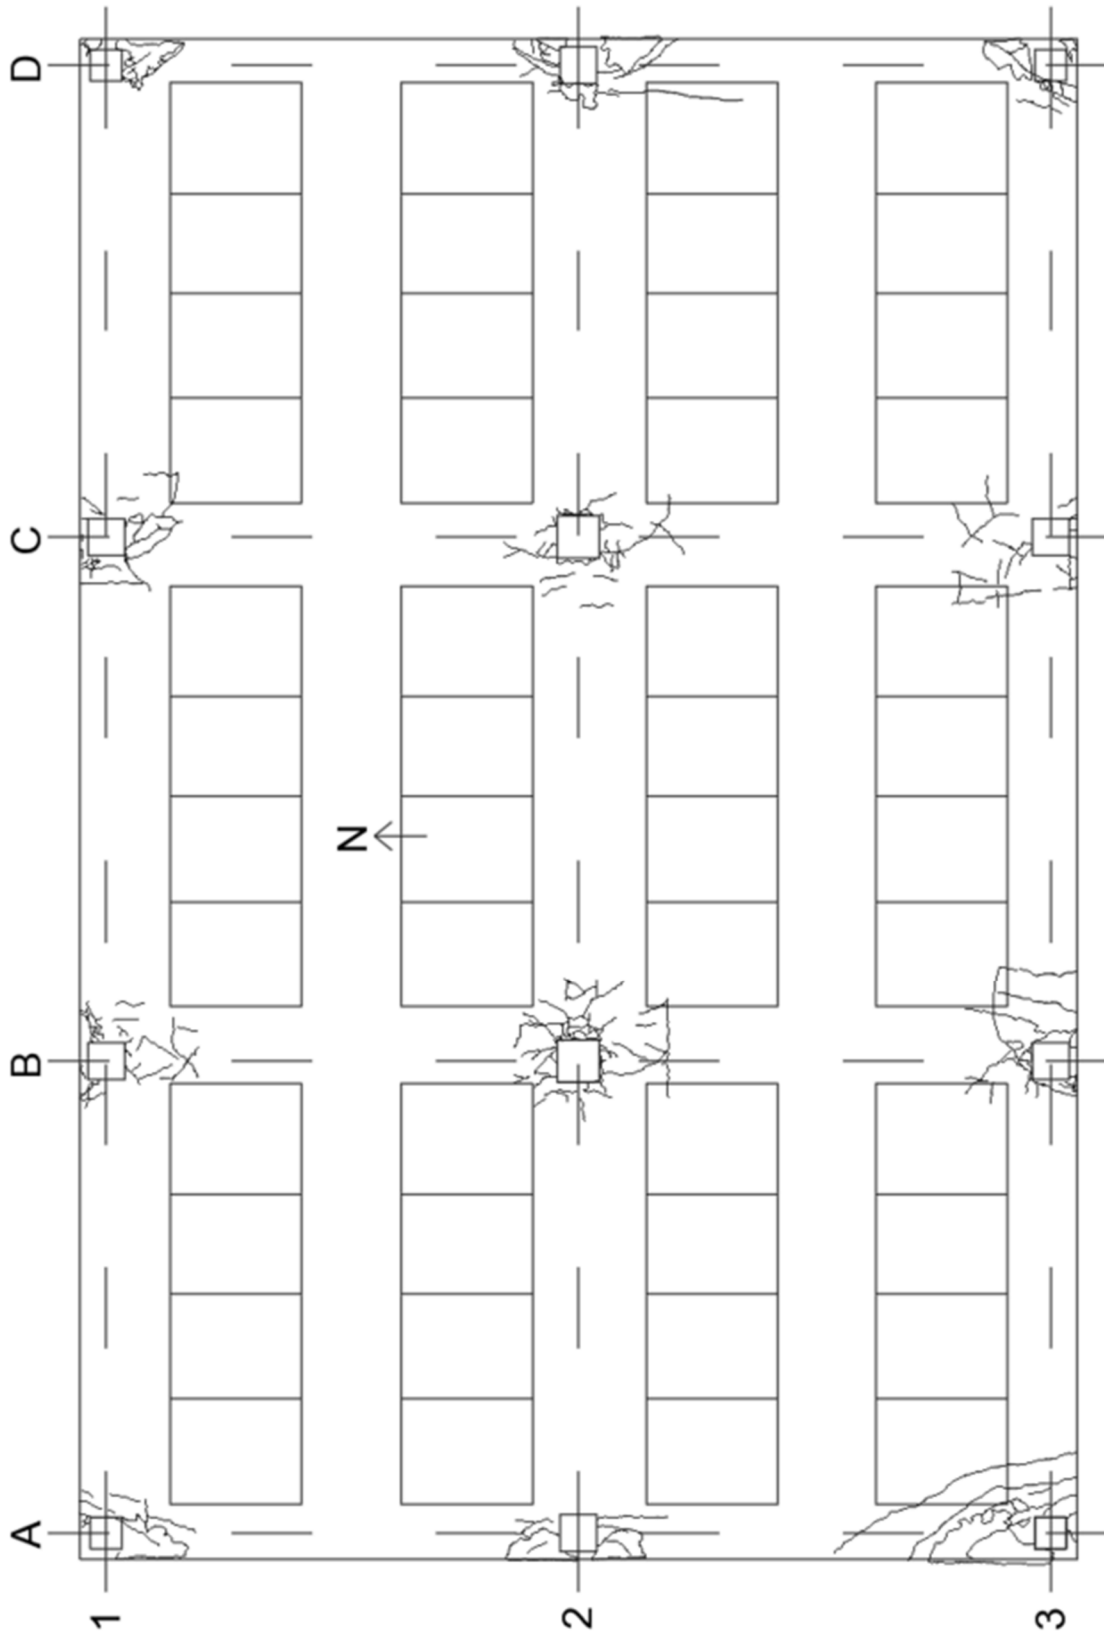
Crack pattern intrados 1st floor Test Cyc-1 (f02).
